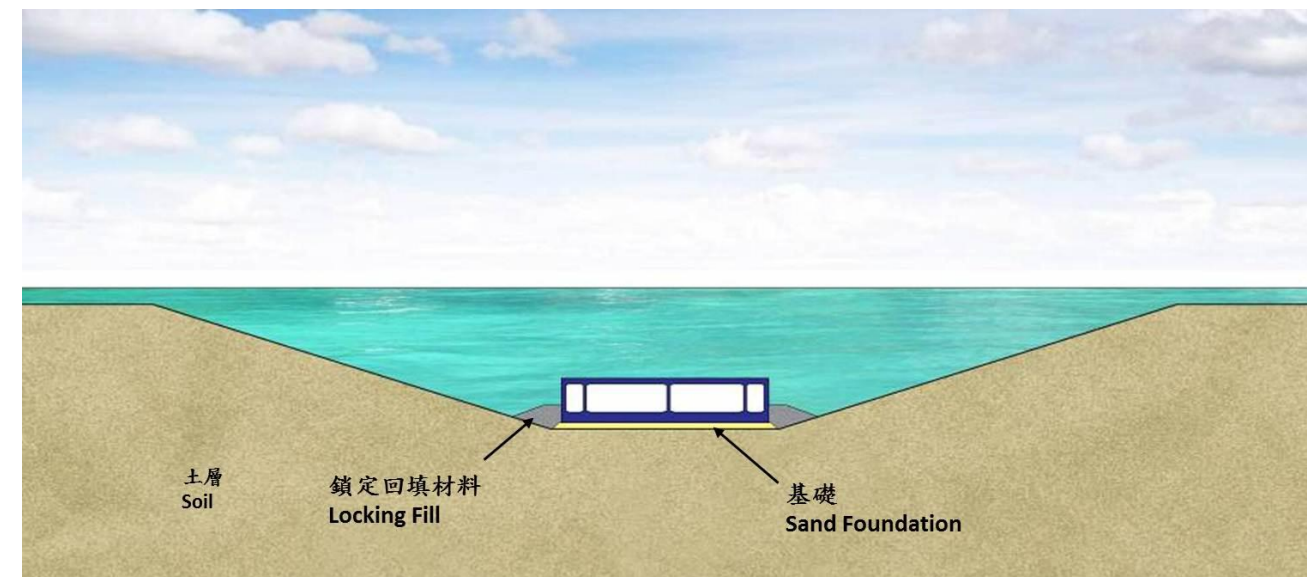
(c) Step 3 – Sink and Merge Pre-Cast Tunnel Units and Place Locking Fill
